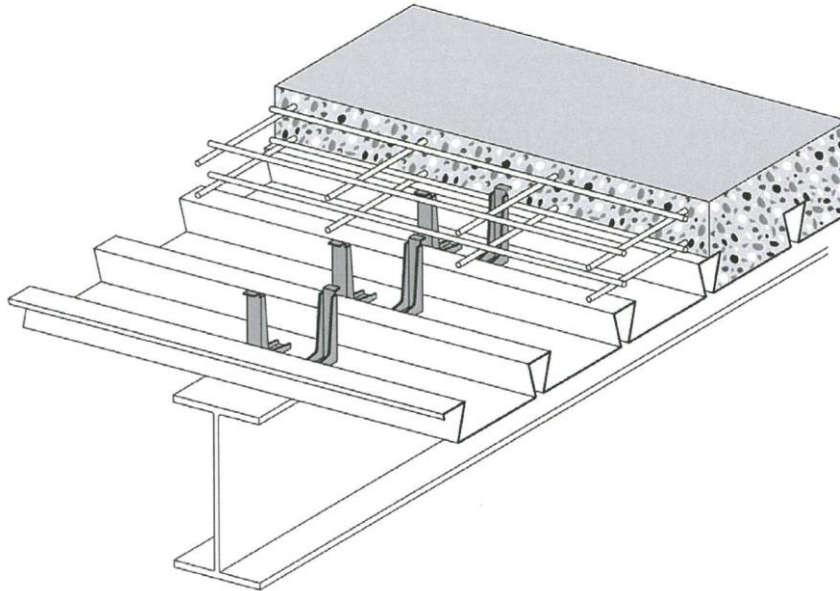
Nailed shear connector (here with 2 rows of shear connectors) for shear connection in composite constructions as well as end anchorage of composite deck.
